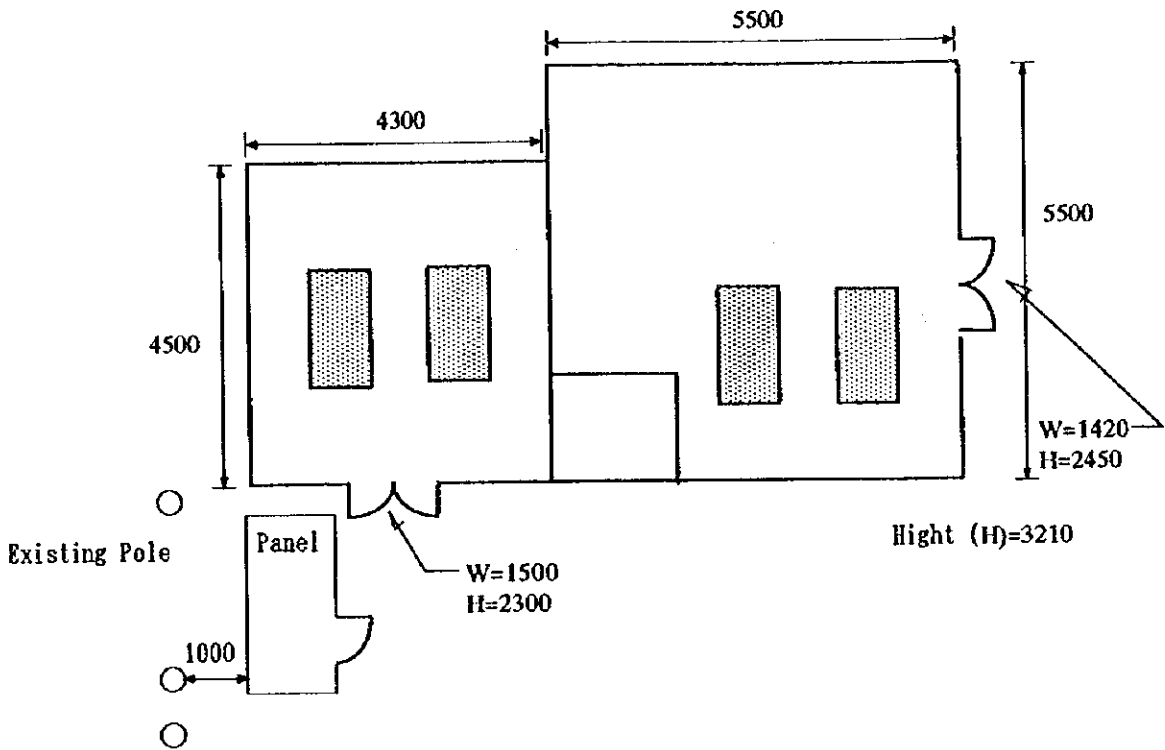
12 Layout Drawing of Buutsagaan
